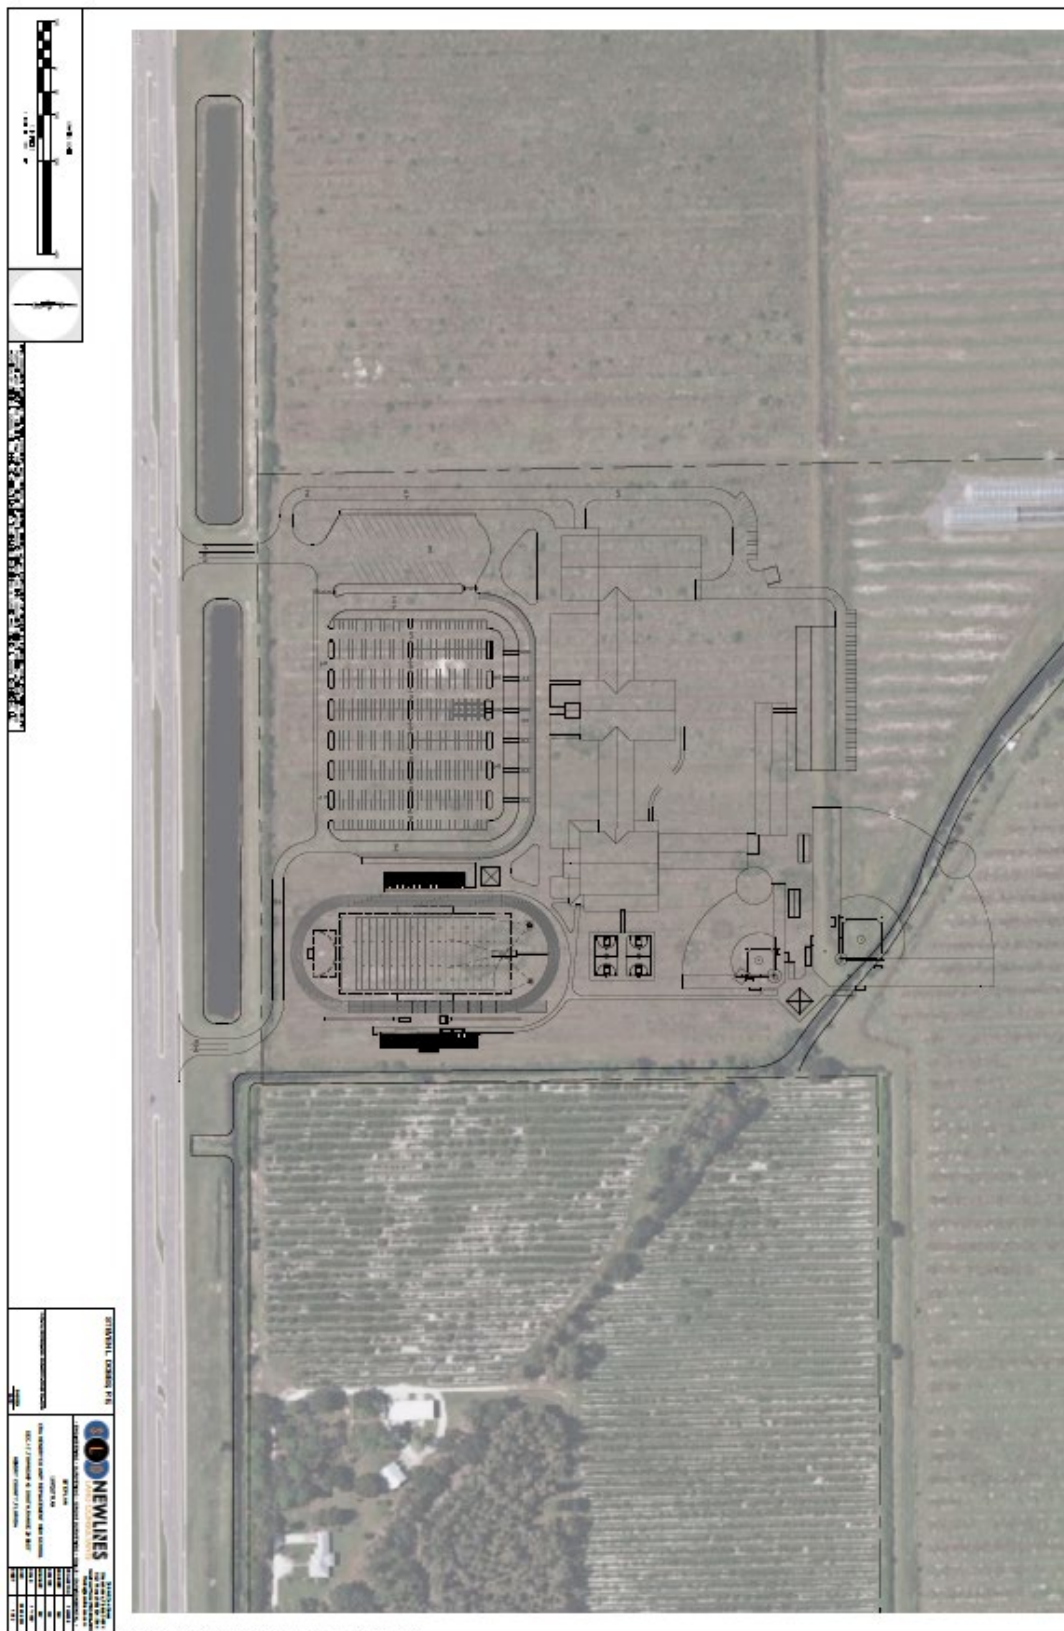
EXHIBIT E - INTERIM HORTICULTURAL RECYCLING SITE PLAN
